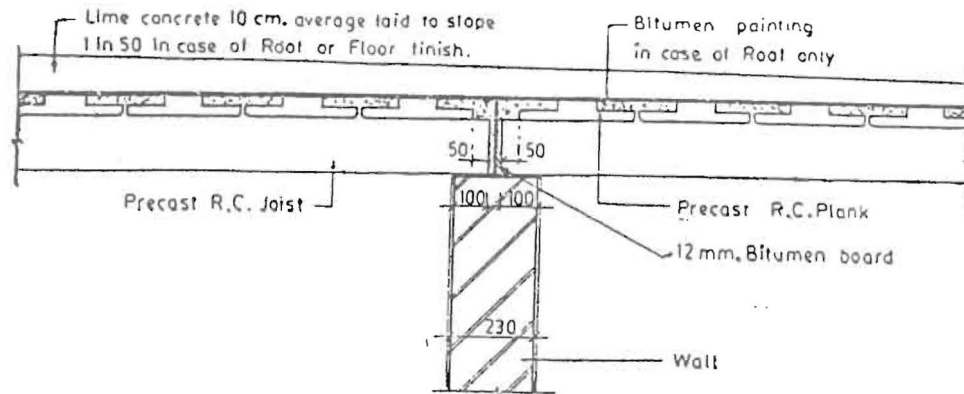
(a) : DETAIL FOR SIMPLY SUPPORTED JOIST AT SUPPORT
